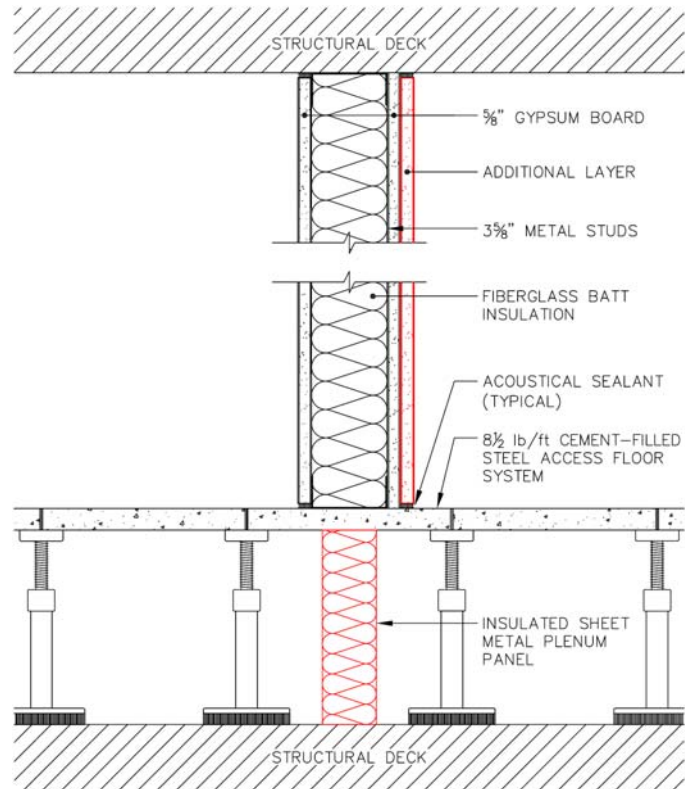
Wall Type 2 for Exec. Offices & Conf. Rooms
